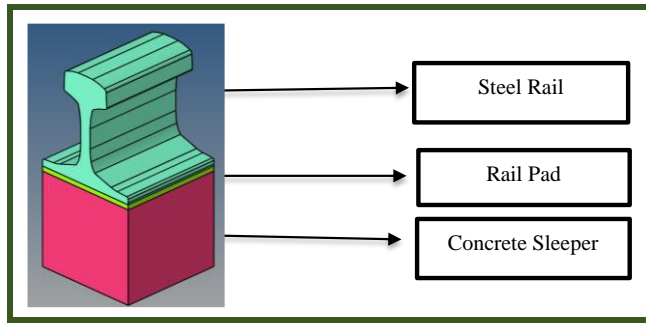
Isometric View of the Steel Rail, Rail Pad and Concrete Sleeper
